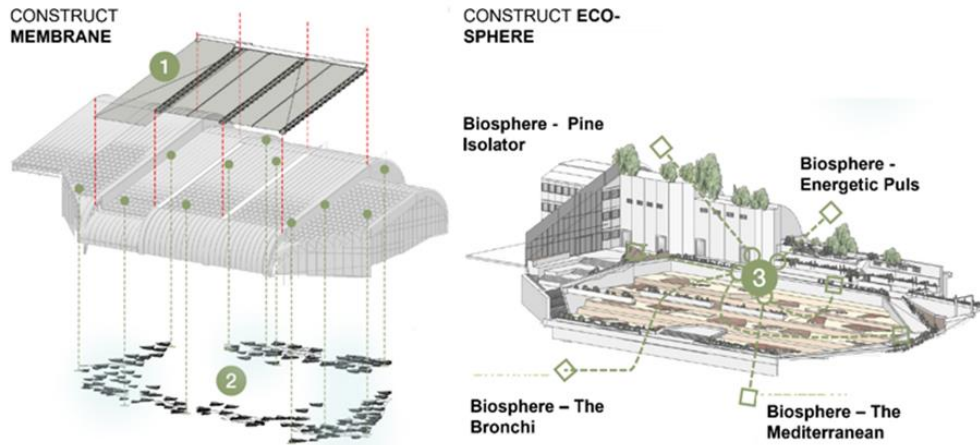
Construct Diagram: Area 1 -Outer Construction Upgrade Roll, Area 2 Collapsible roof-shade system, Area 3 Interior multifunctional construct
